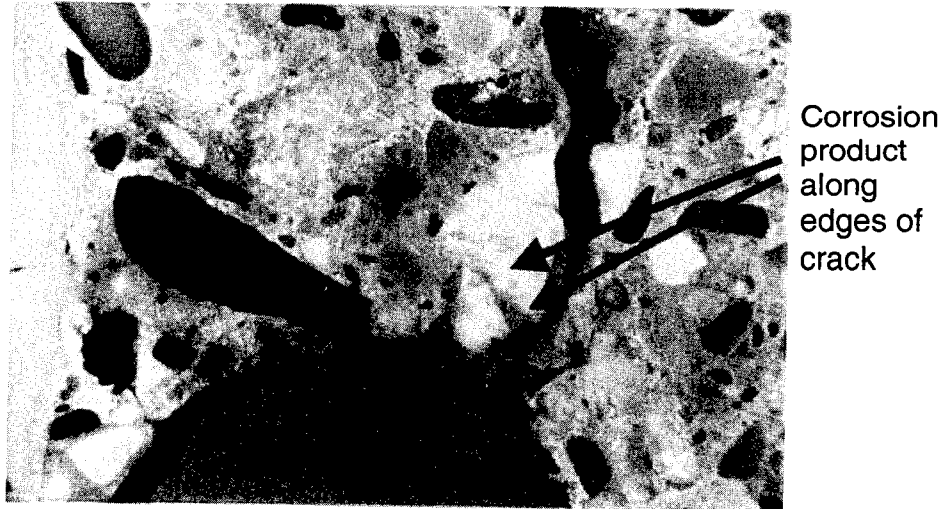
Close-up of cross-section from figure 46 showing limited diffusion of steel corrosion product along the fracture plane surfaces.
